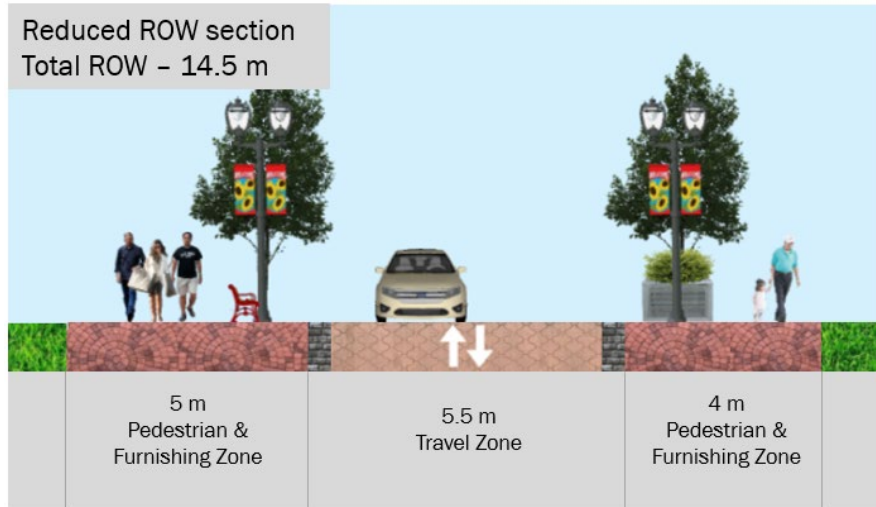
TYPICAL CROSS SECTION OF THE REDUCED RIGHT-OF-WAY SECTION
